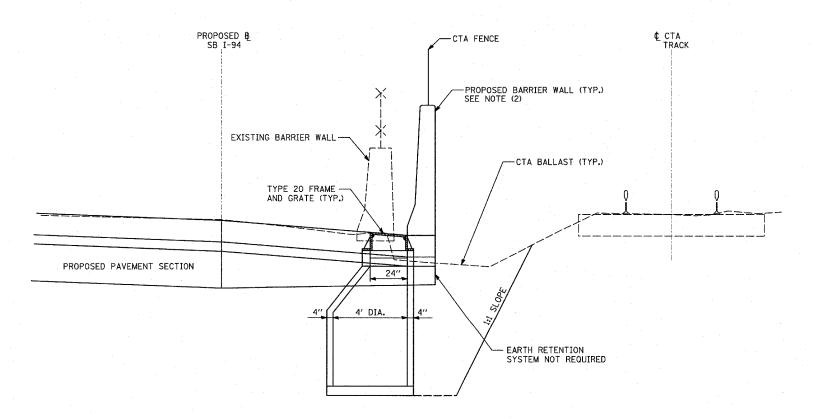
PROPOSED CATCH BASIN - TYPE "A" 1. SLOPE SHOULDER AREA BETWEEN PROPOSED CATCH BASIN AND BARRIER WALL TOWARDS GRATE - TRANSITION BACK TO SHOULDER SLOPE WITHIN 10' EITHER WAY FROM © OF GRATE.
